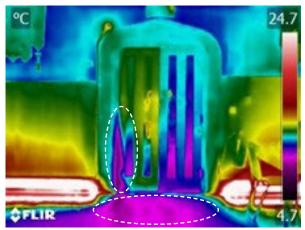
IR image showing air leakage through door into kitchen area and cold meeting room floor
